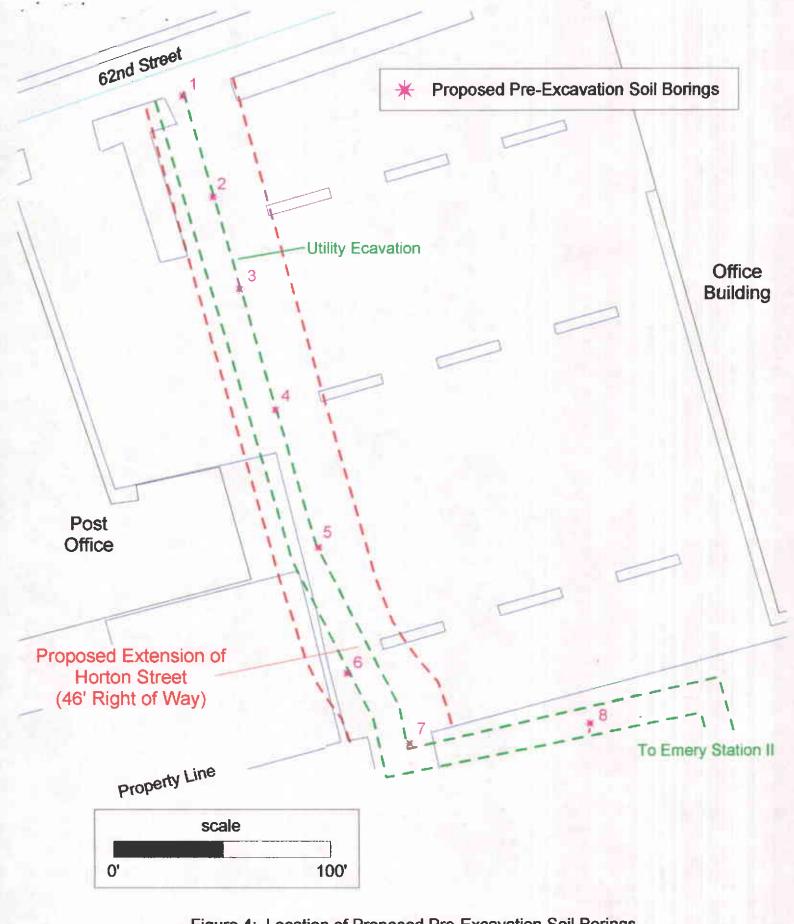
Location of Proposed Pre-Excavation Soil Borings
